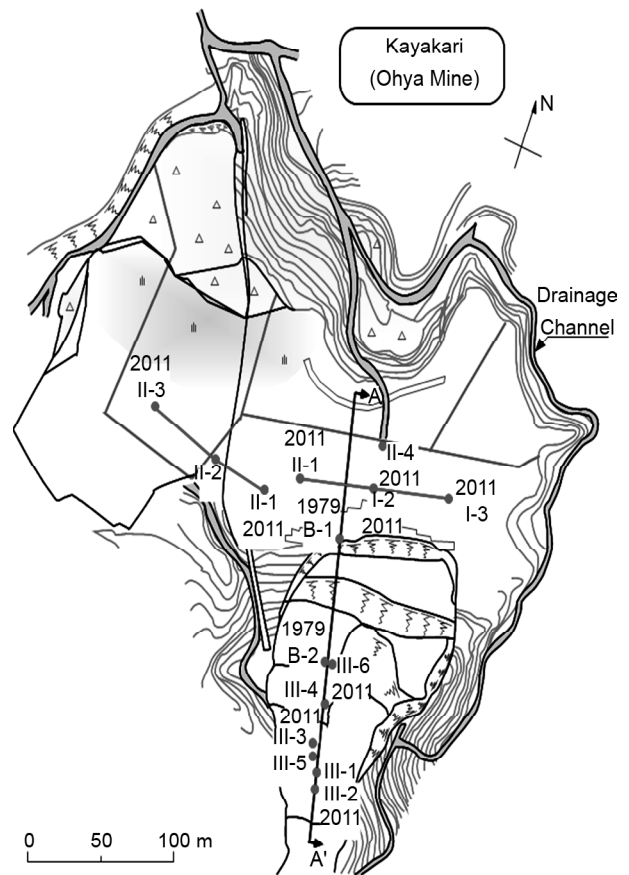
Plan view of the failed tailings dam at Ohya mine.
